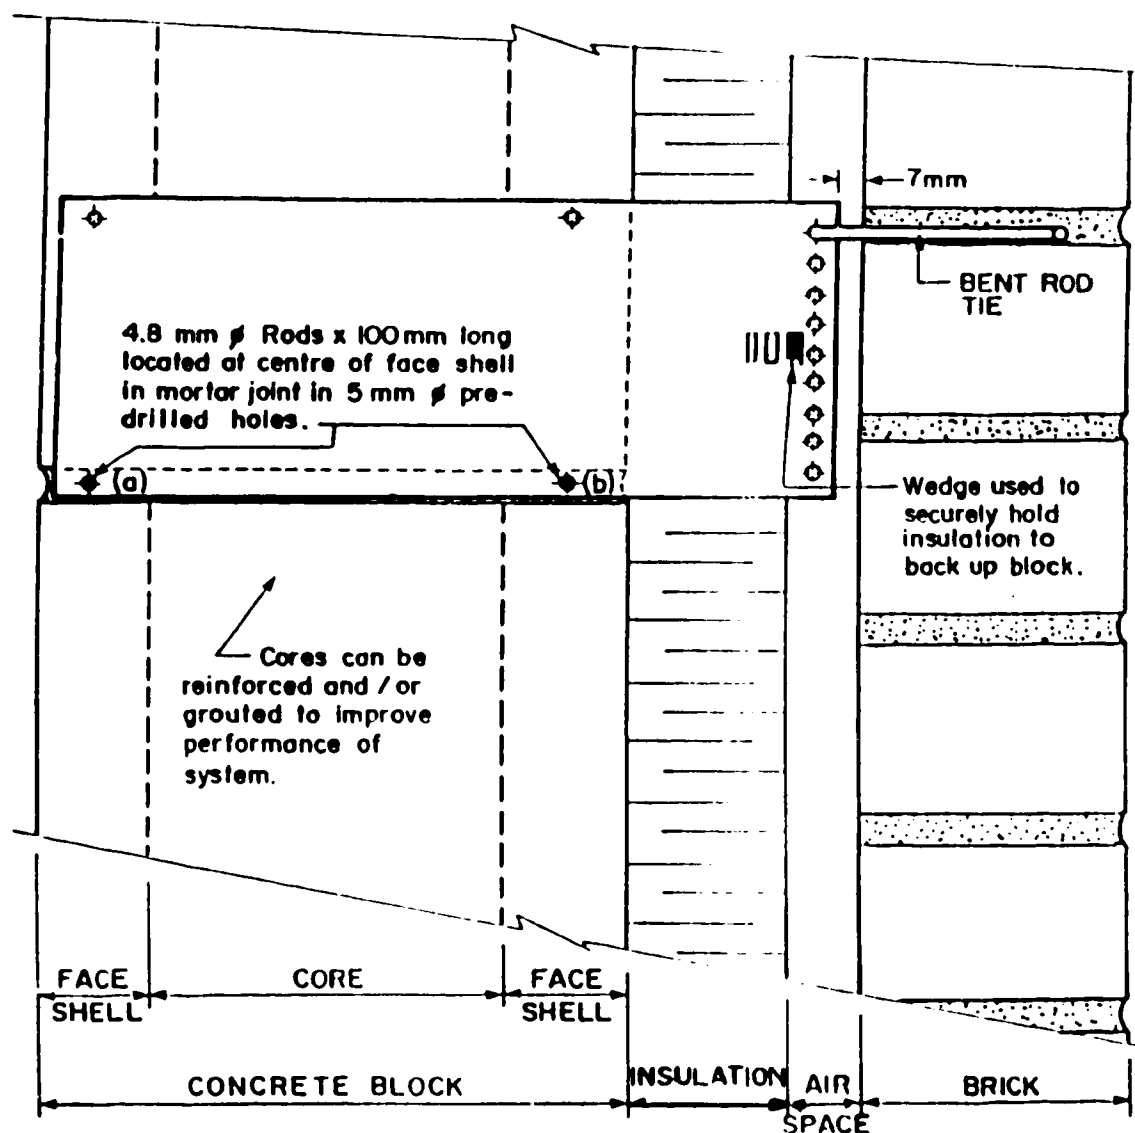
Shear Connector Application With Concrete Block Back-Up
